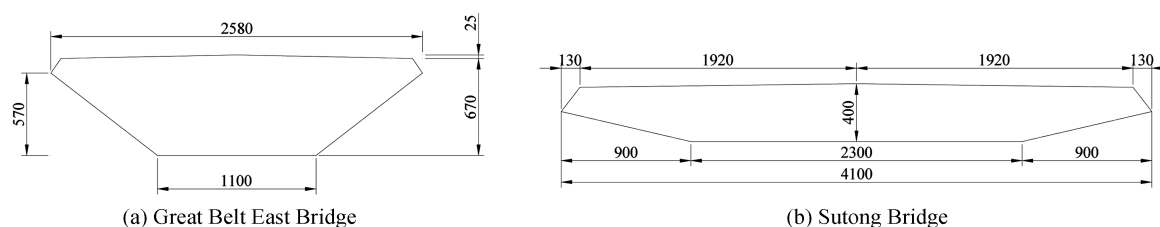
Two box girder sections discussed in this paper (unit: cm)
